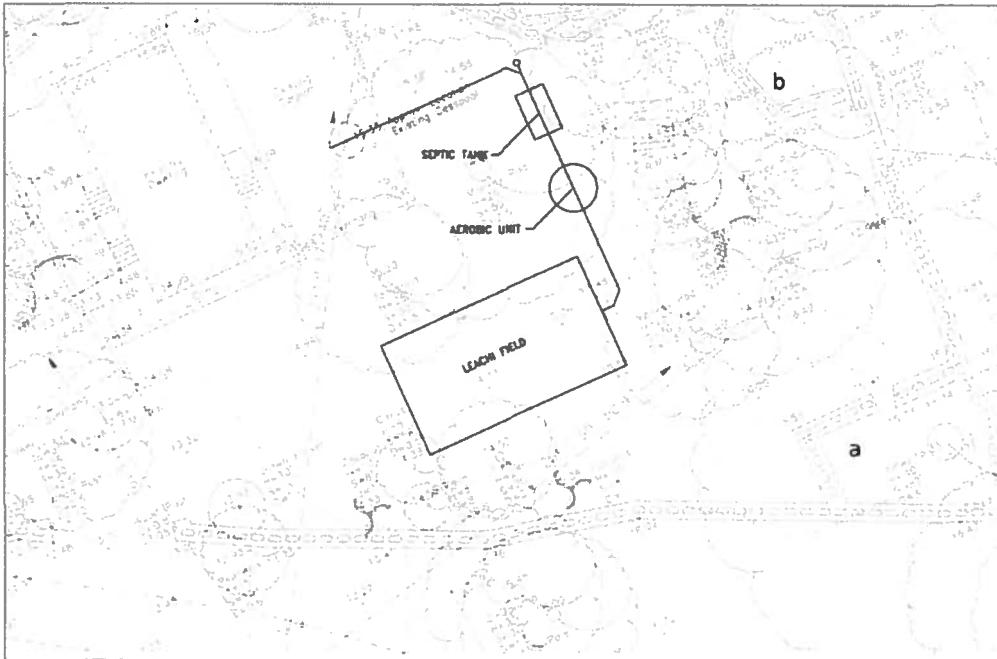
Engineering map showing the location of proposed wastewater facilities on parcel 33 and dry-laid stone masonry structures: *a*, platform; *b*, enclosure.
